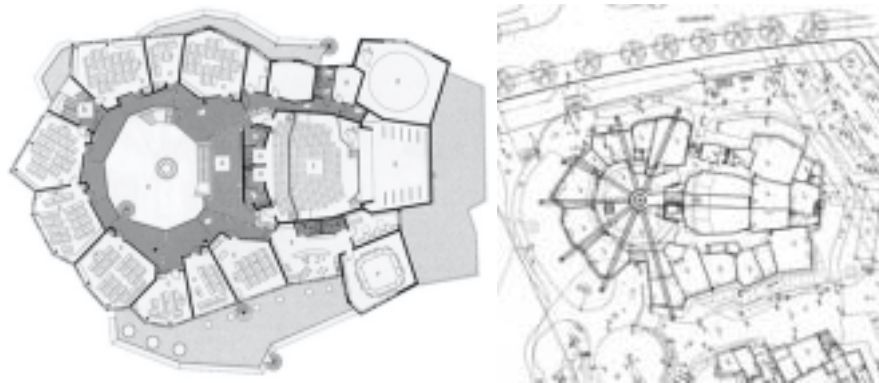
The plan of the Waldorf School is built up around the central hall into which exhaust air from the classrooms is collected and subsequently exhausted (*left*). The central hall is provided with fresh air through seven embedded pipes, as indicated on the situation plan (*right*).
